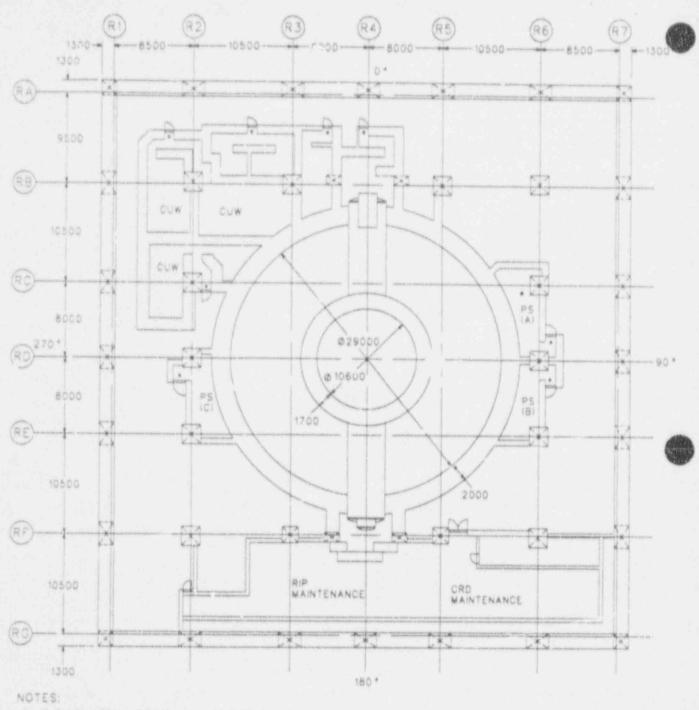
C REACTOR BUILDING ARRANGEMENT - T.M.S.L. -8200
